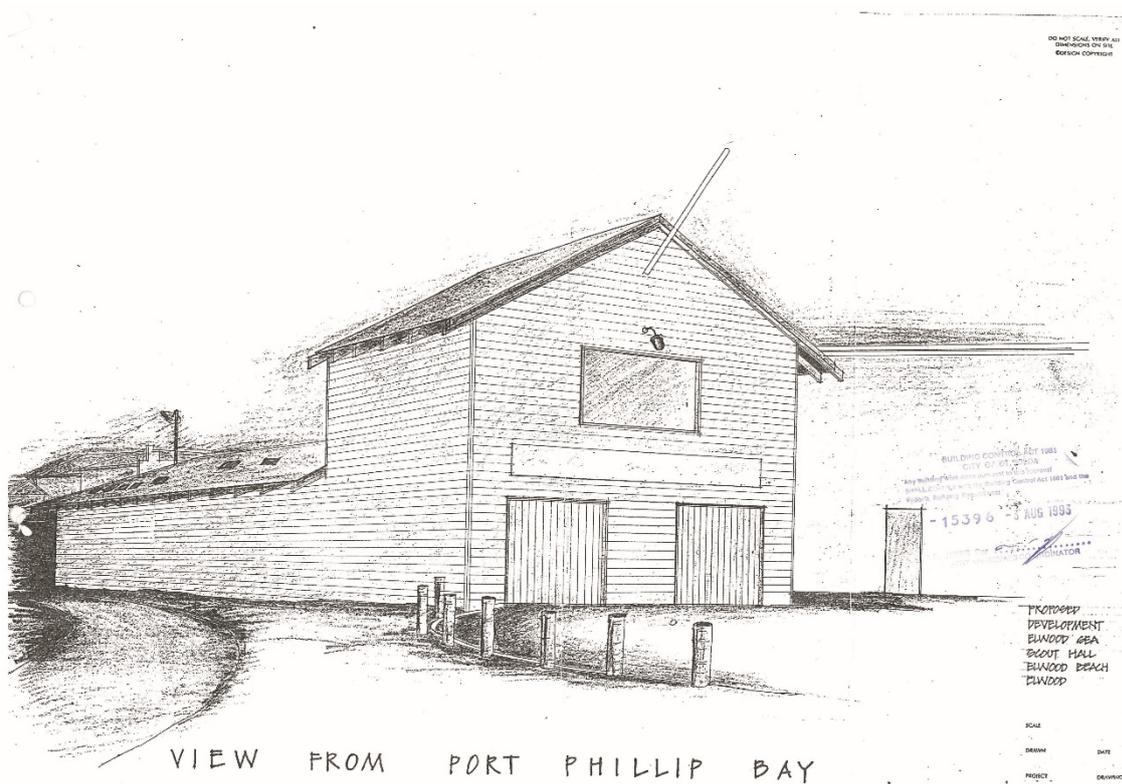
Perspective drawing of the proposed development plans for the Elwood Sea Scout Hall approved in 1993, showing additional sky lights (Source: City of St Kilda)
